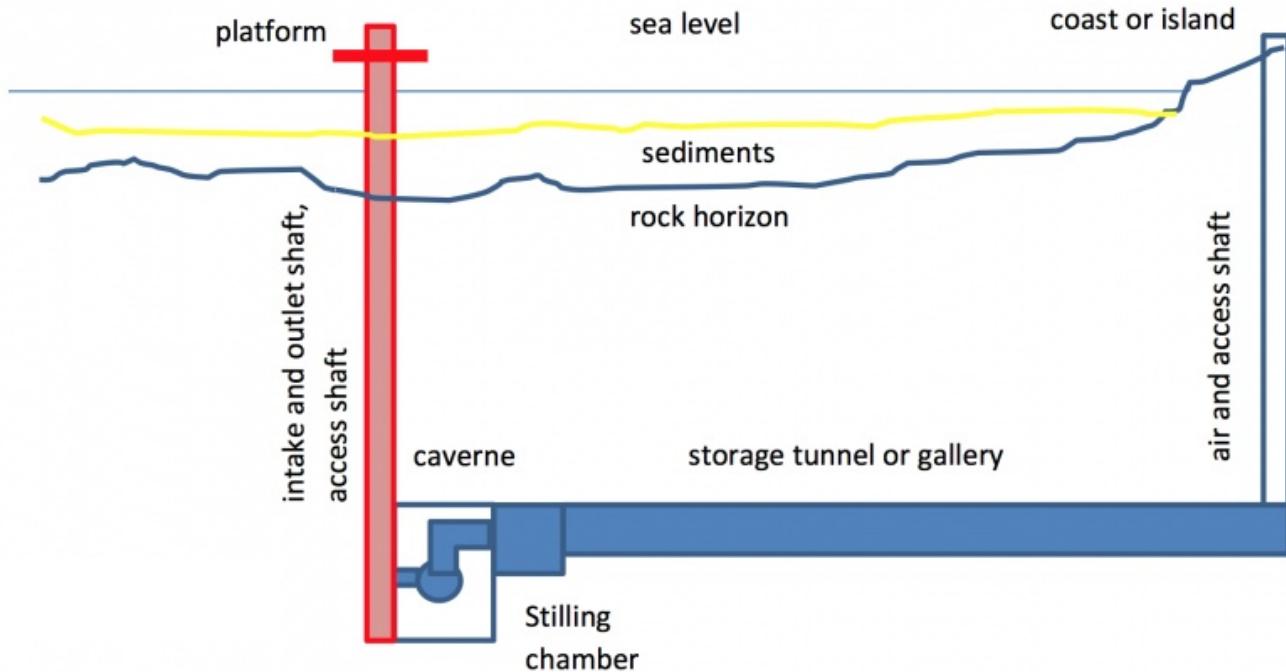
LONGITUDINAL SECTION SHALLOW WATER TYPE
